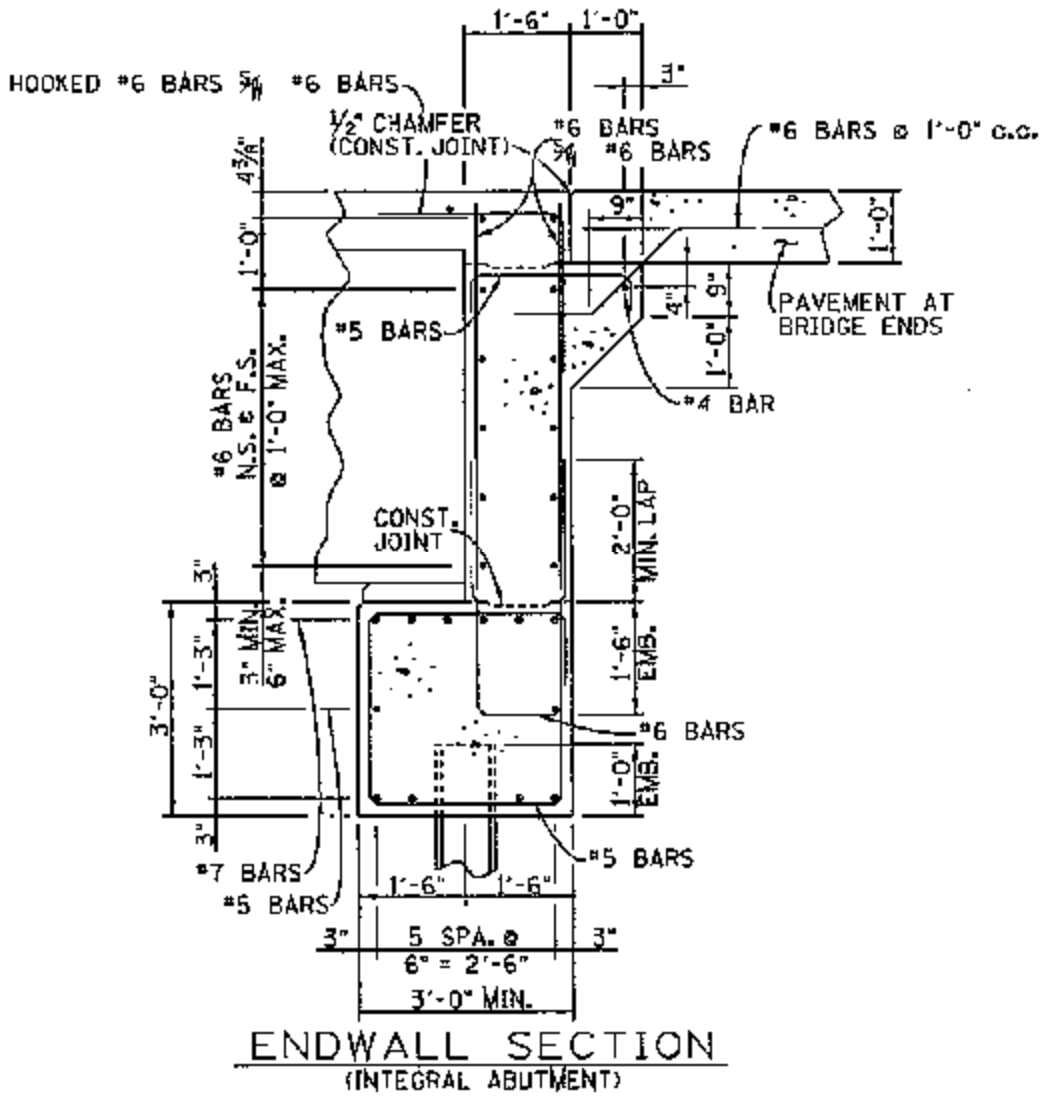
Example detail of a full integral abutment (courtesy of Tennessee DOT)
